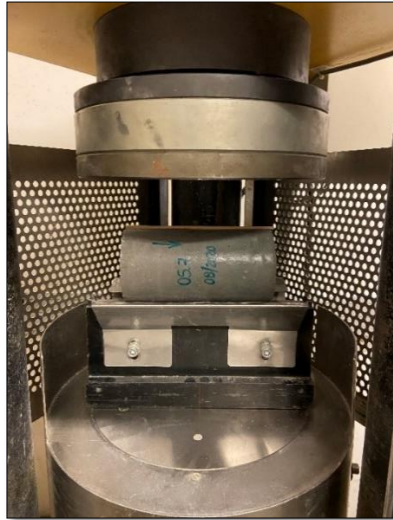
Oyster shell concrete specimen placed for the tensile splitting test.
